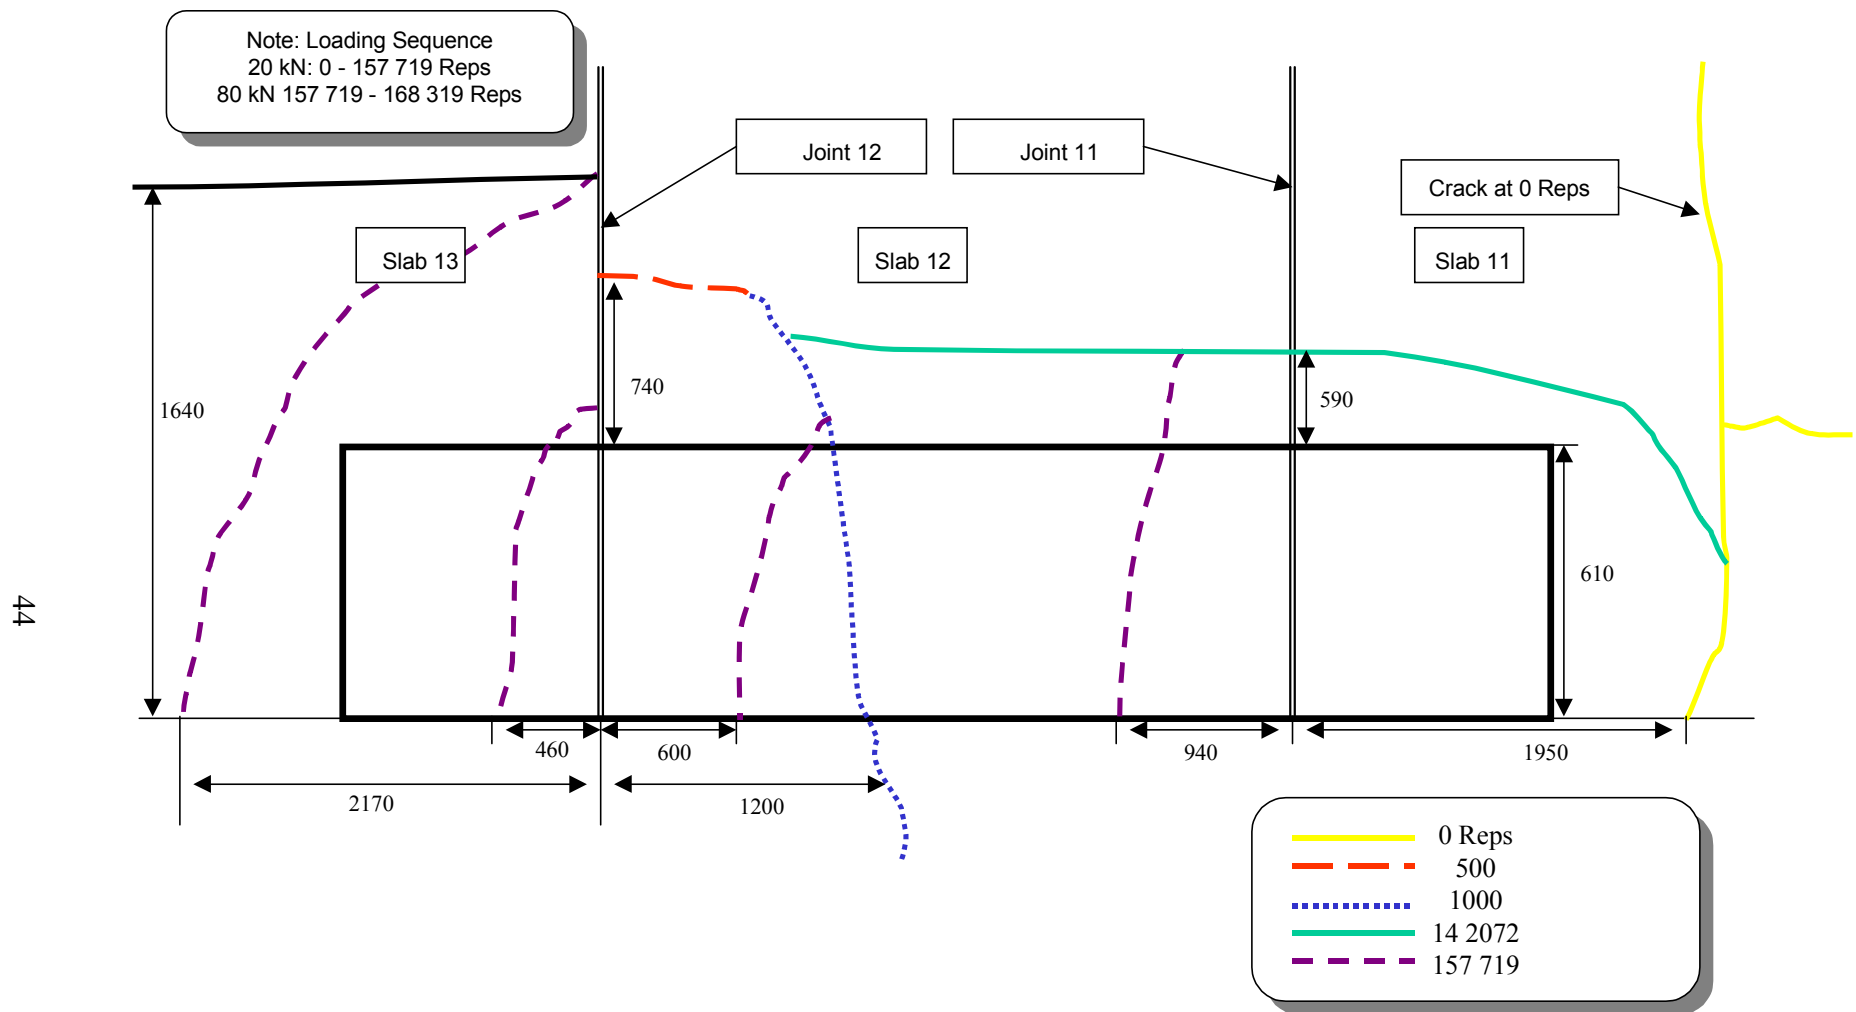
Schematic of crack development, Test Section 521 (not to scale).
